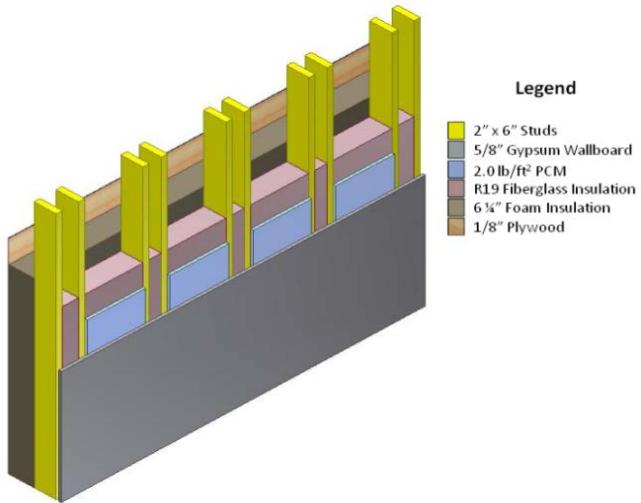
Schematic Diagram of 2.0-lb/ft² Wall Test Setup
